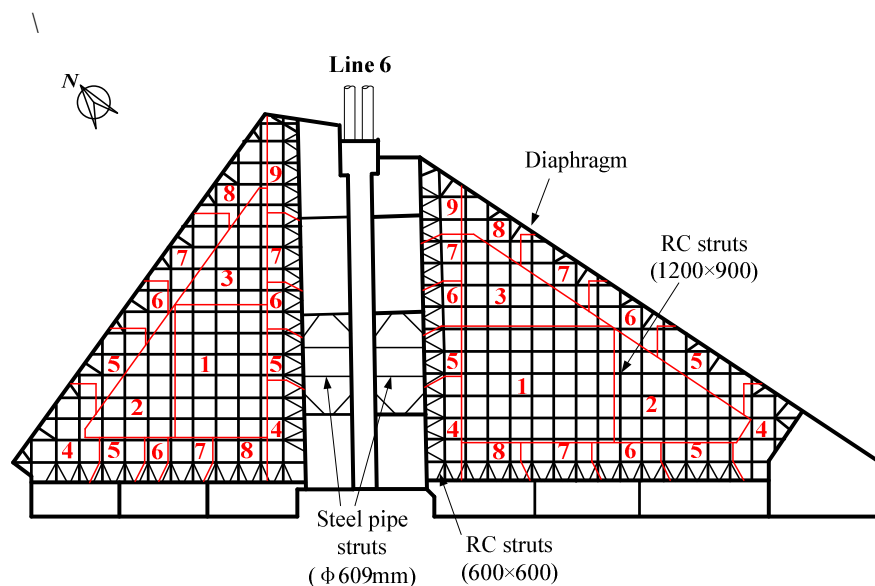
Reinforced concrete (RC) struts and excavation procedure of large pits.
